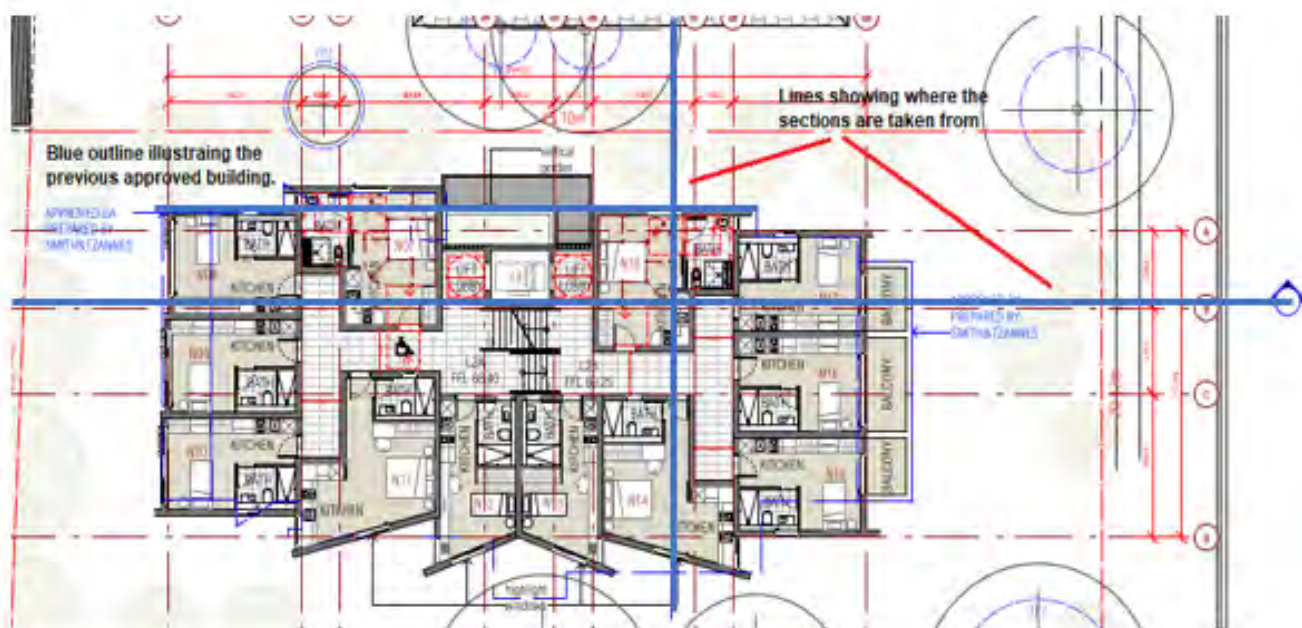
Level 2 floor plan of the proposed development with the outline of the previous approved building (LDA 2018/90) outlined in blue.
